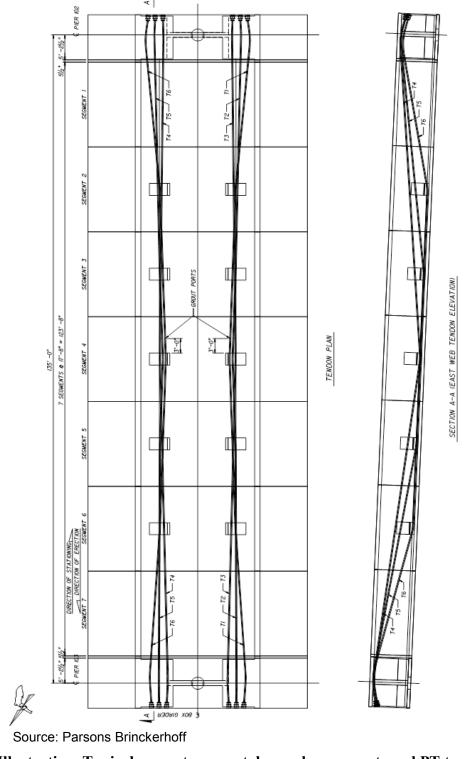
Illustration. Typical precast segmental span-by-span external PT tendon layout.
